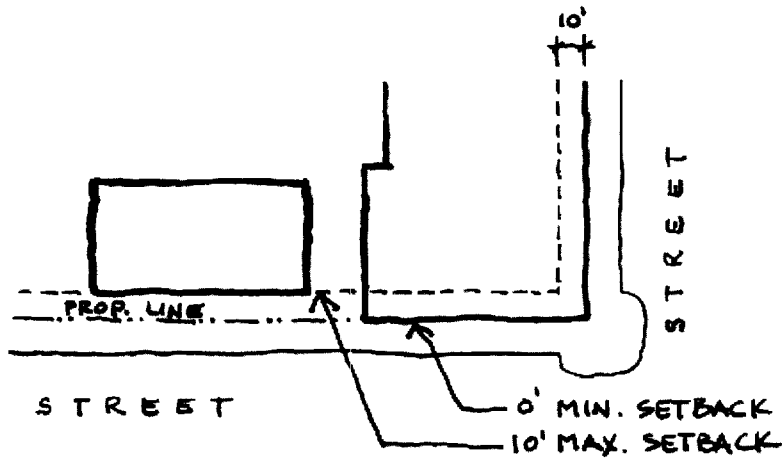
Building Setbacks from Street-Facing Property Line in MU-R District
